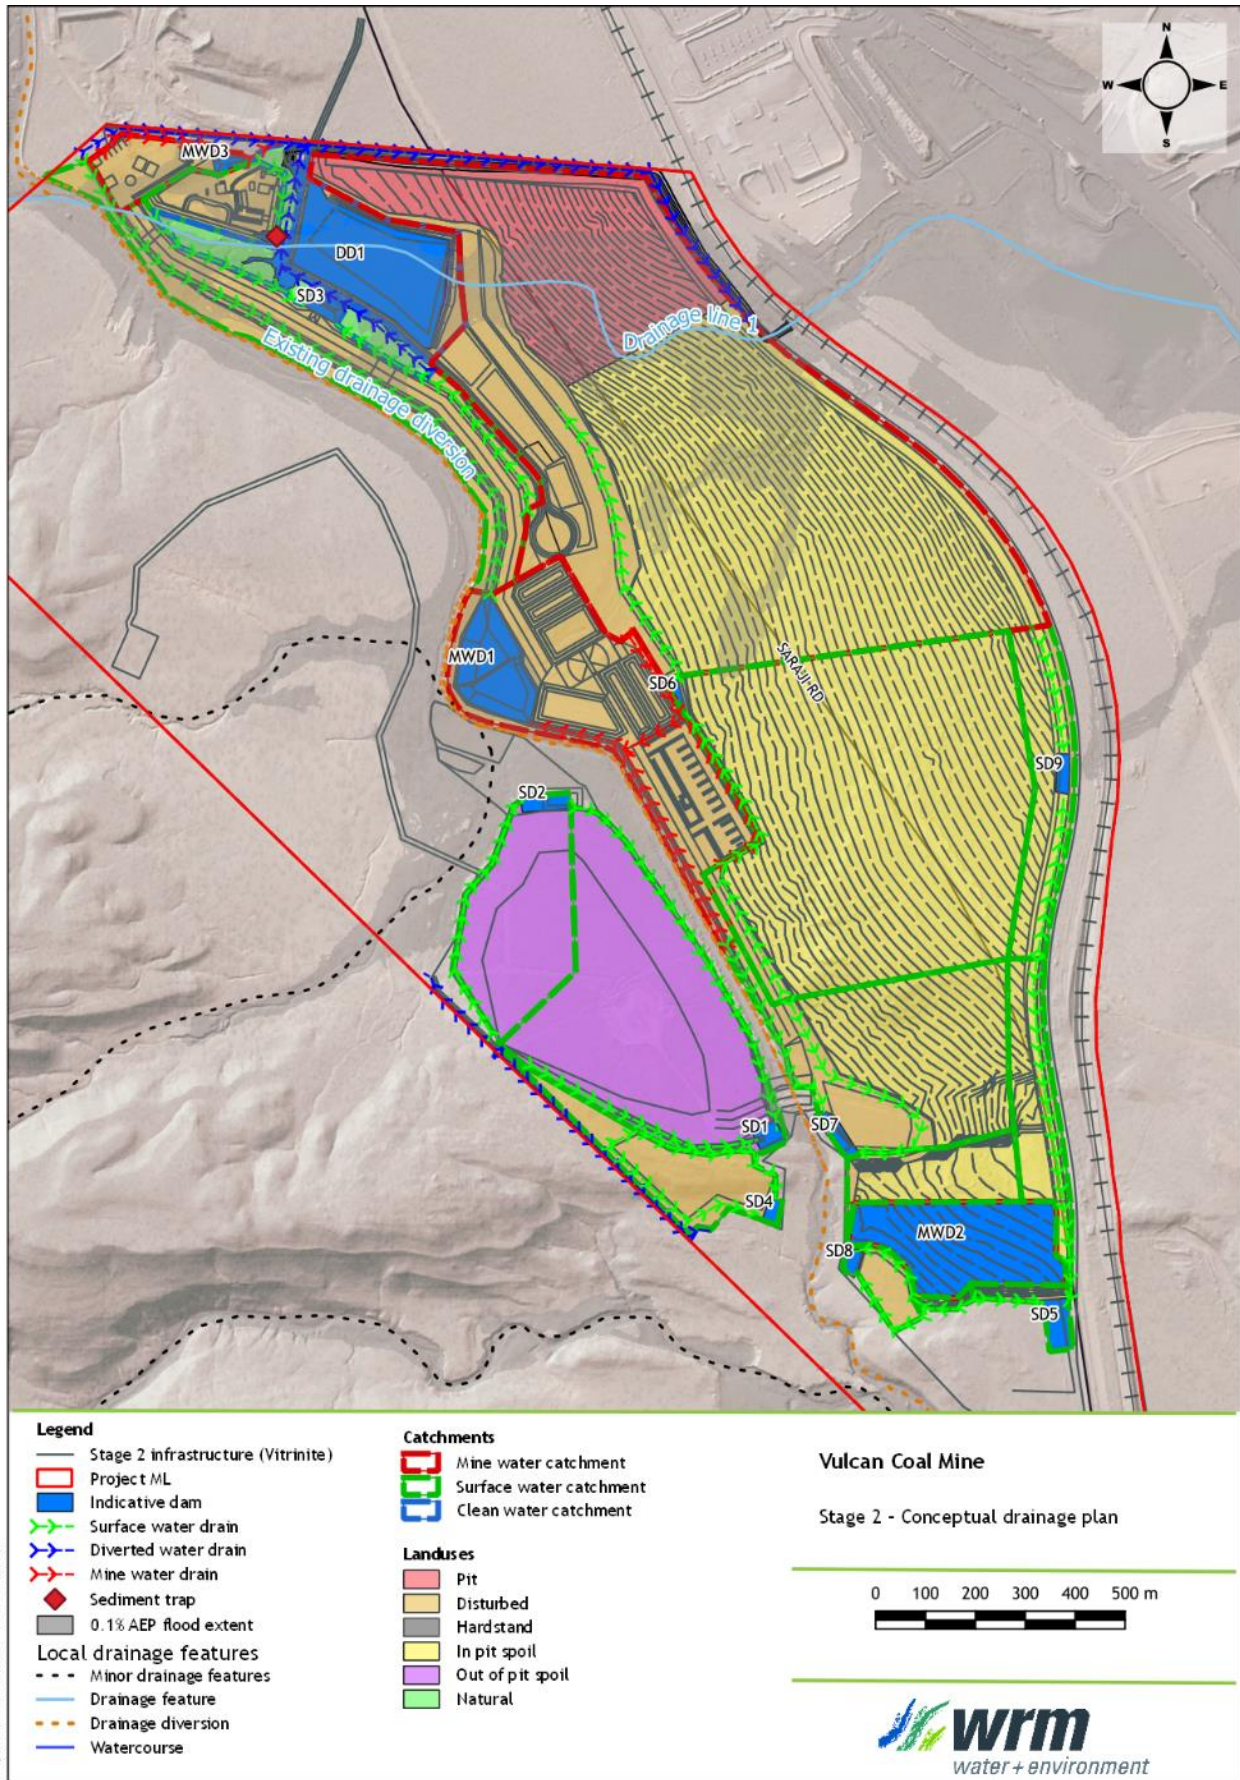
Stage 2 (Year 2024) conceptual drainage plan
